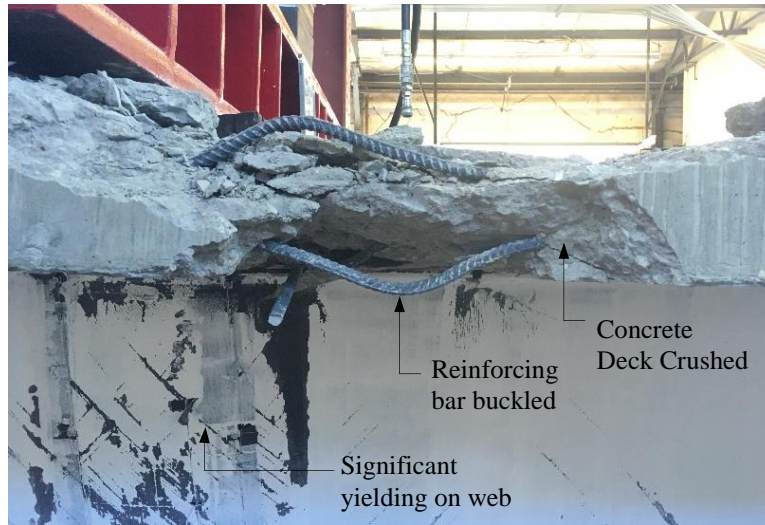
Concrete Deck Reinforcement Buckled – Tub #2
